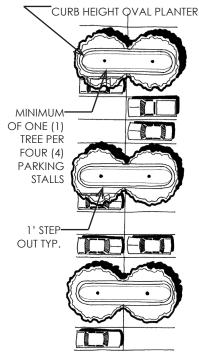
Shade Tree Layout in Parking Lots (Alternate)
